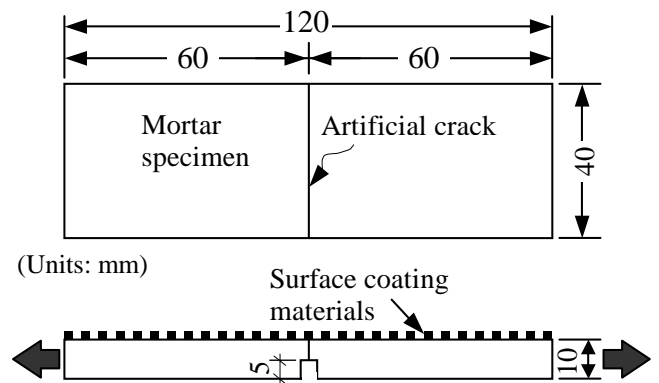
The test of concrete surface coating material over concrete crack. (JSCE-K-532)
